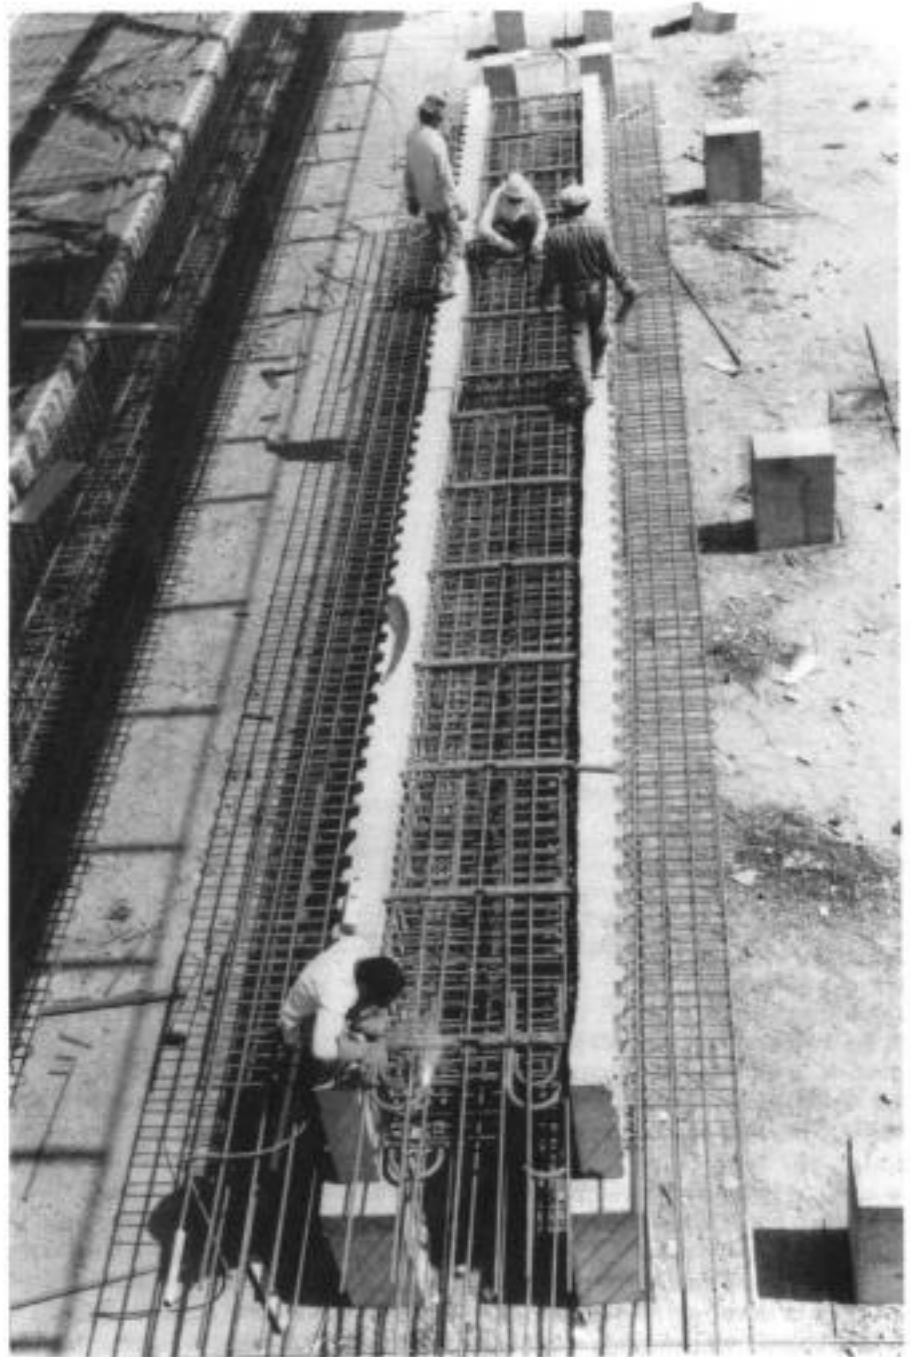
Medinah car park: (a) fabrication of web panel with permanent precast concrete stop-ends to cellular wall;
